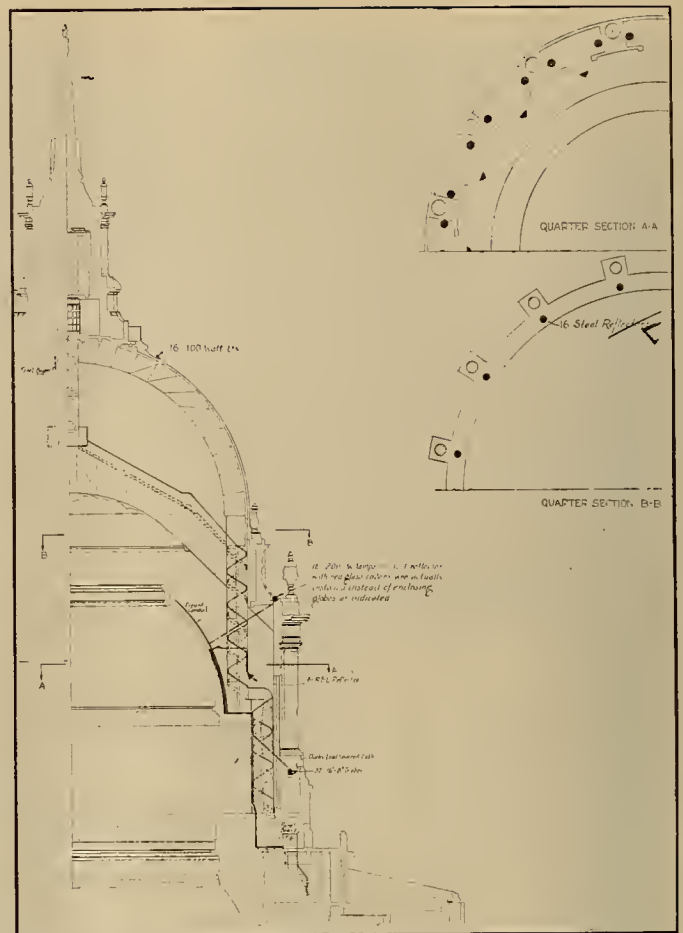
Half elevation and two quarter sections showing arrangement of lights on City Hall dome.
